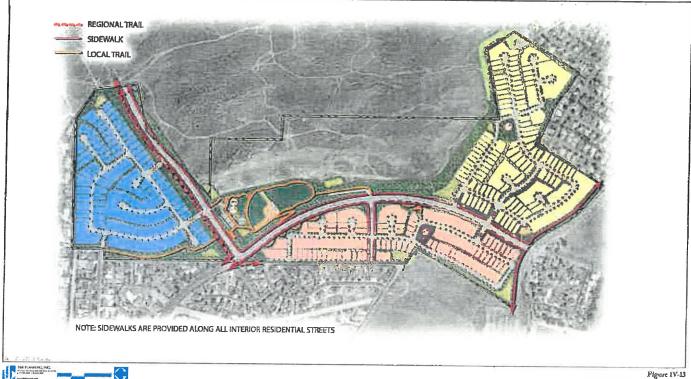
CONCEPTUAL TRAILS PLAN Page IV-19
